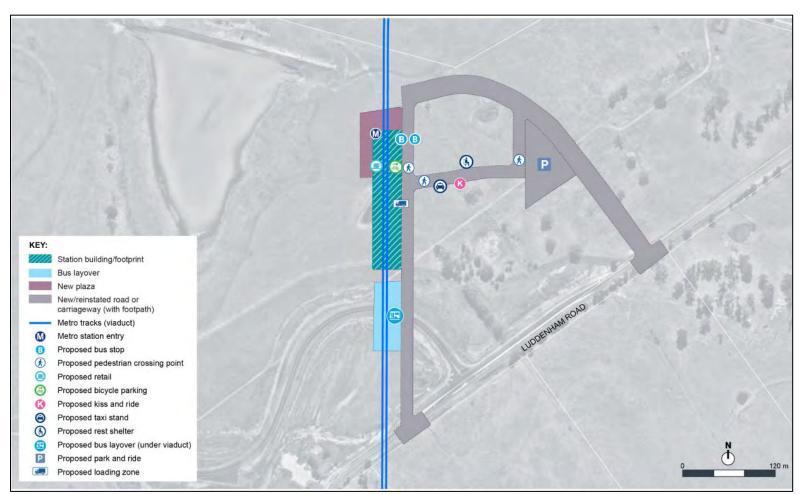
Luddenham Road indicative operational layout and key design elements – Approved Project (SM-WSA EIS, 2022)
